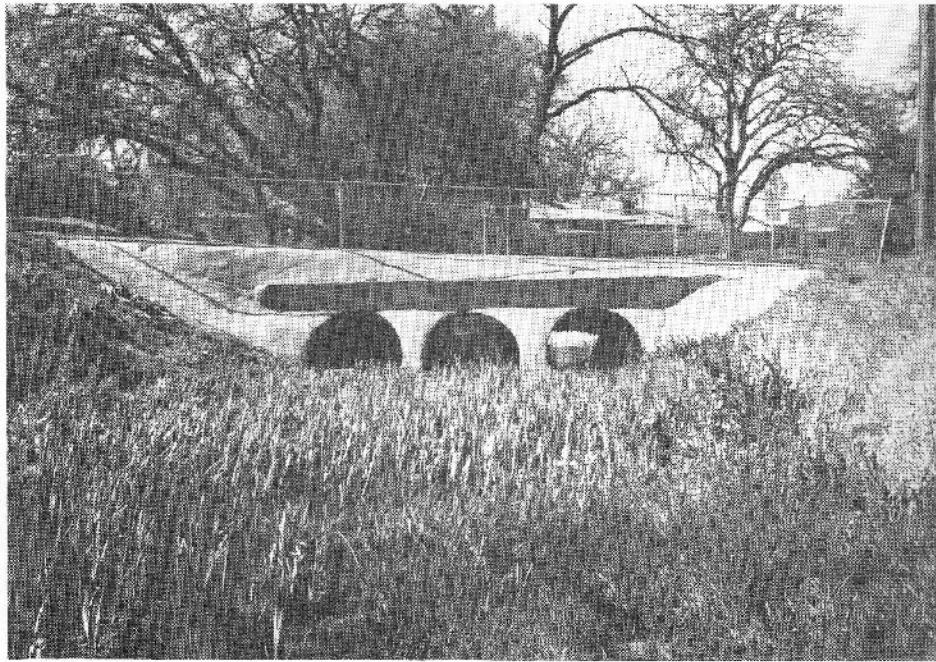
North Footbridge in Royer Park, Dry Creek.
